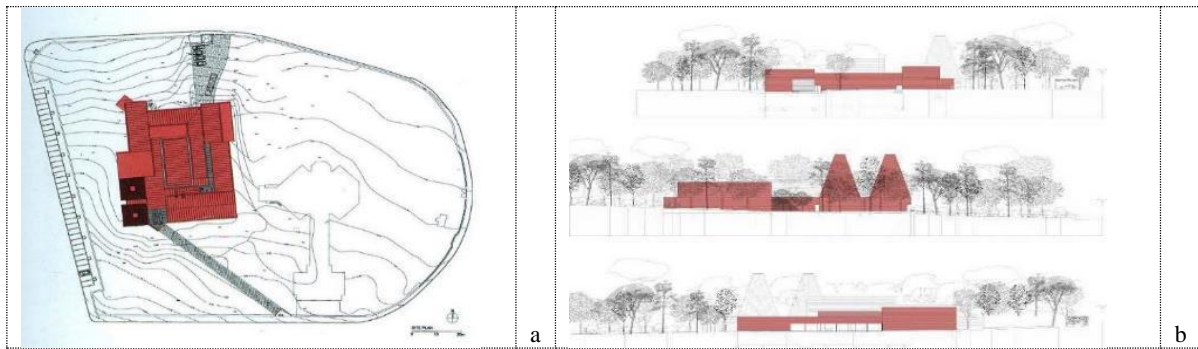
a. Paula Rêgo Museum site plan (URL-193) b. Paula Rêgo Museum Elevation drawings (URL-194)
